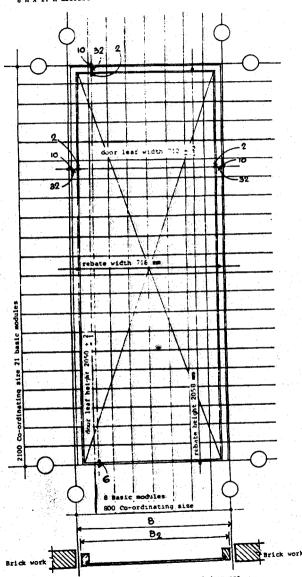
Plan and elevation of door set Dimensions in millimetres
